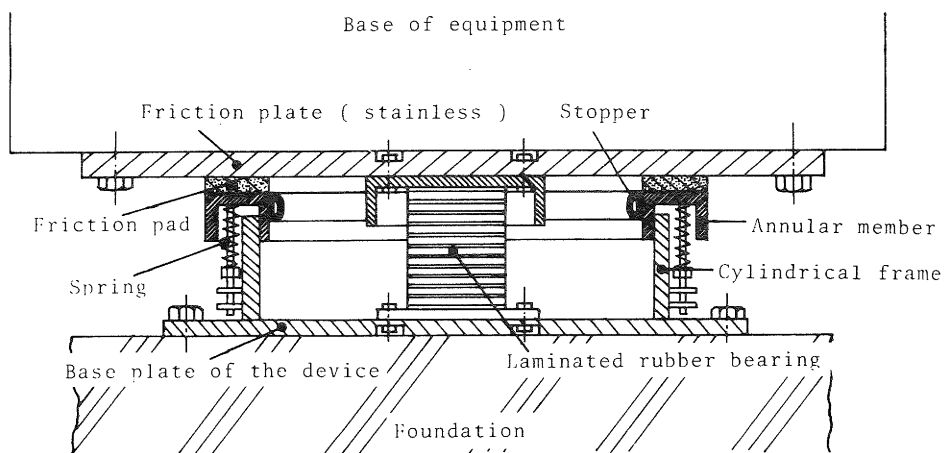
Schematic Drawing of an Isolation Device for Heavy Equipment (in cross-section).
